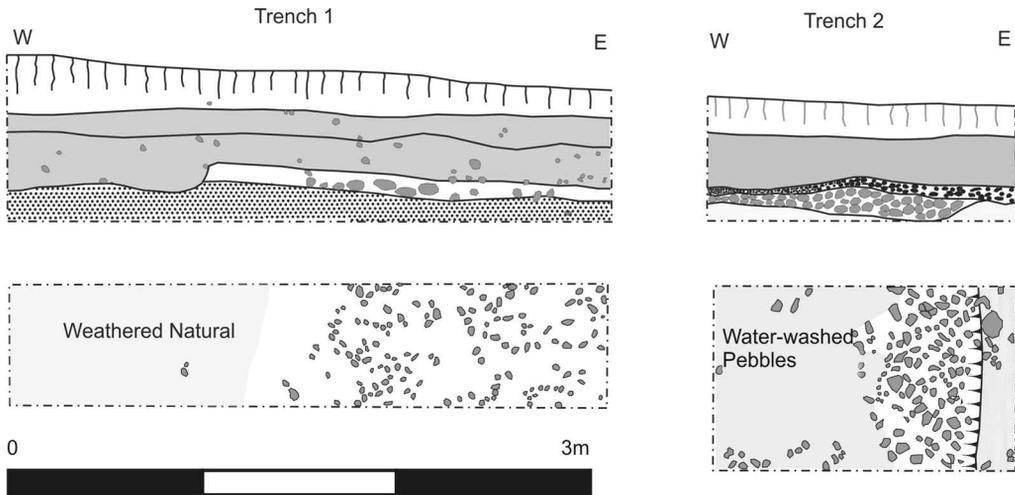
Stane Street, Ewell, 43 Staneway: sections and plans of road.
